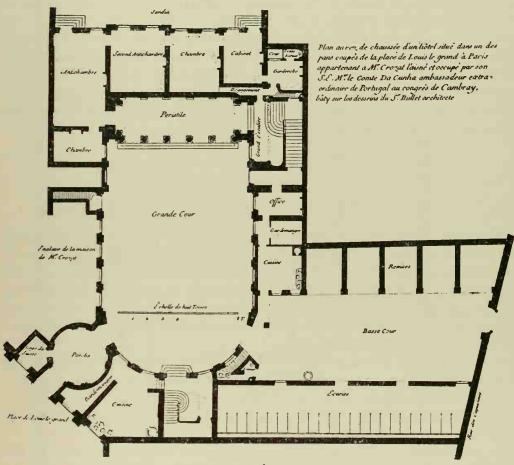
Bullet: Hôtel d'Évreux: Plan of first floor
